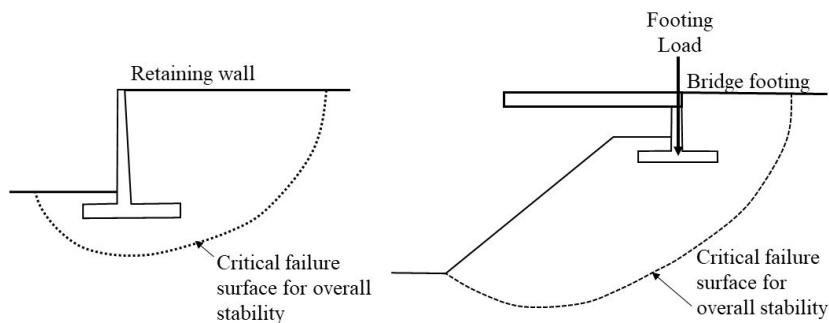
Examples Illustrating the Concept of Overall Stability as Applied to the Situation when a Slope Supports a Structural Element
